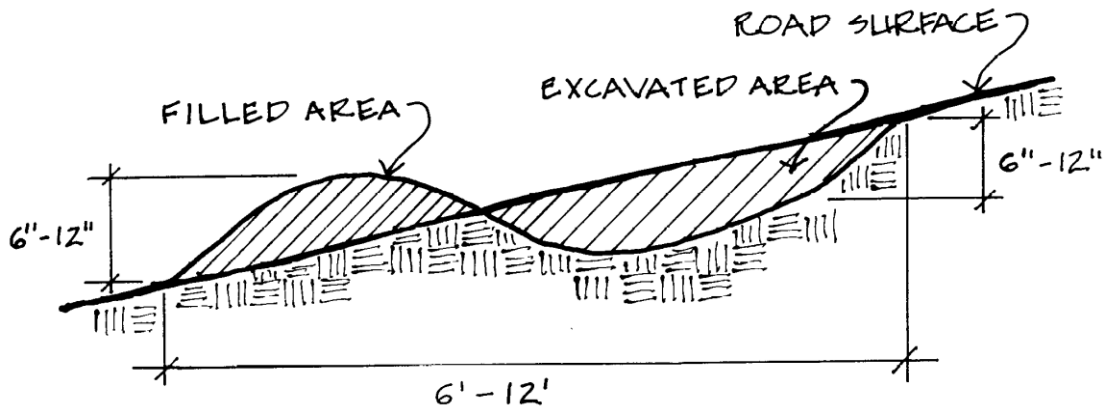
A cross section of a waterbar constructed within an access road (Commision, 2001)
